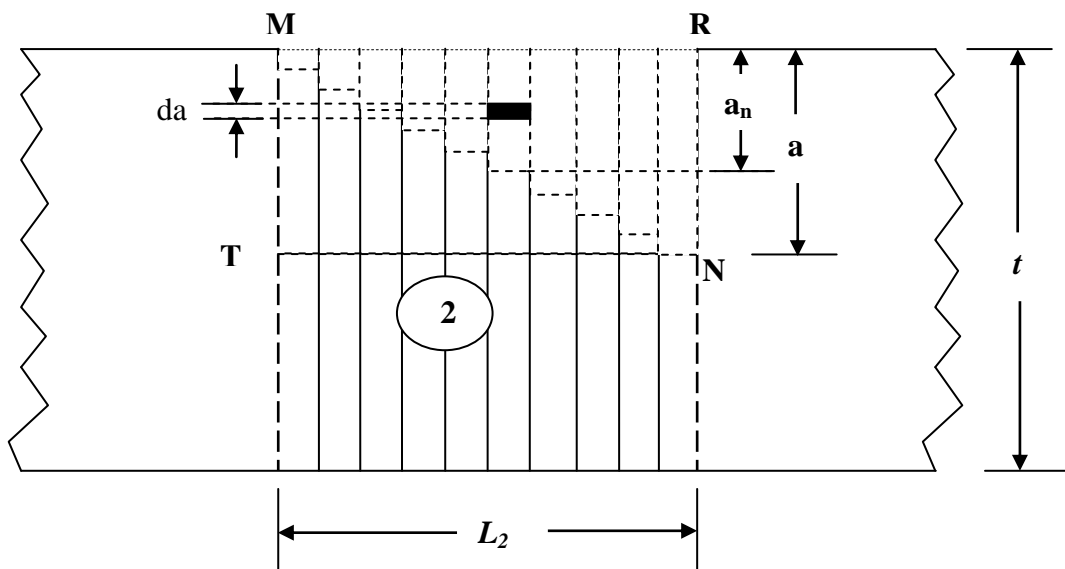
Magnified view at the inclined crack section having equal no. of division
